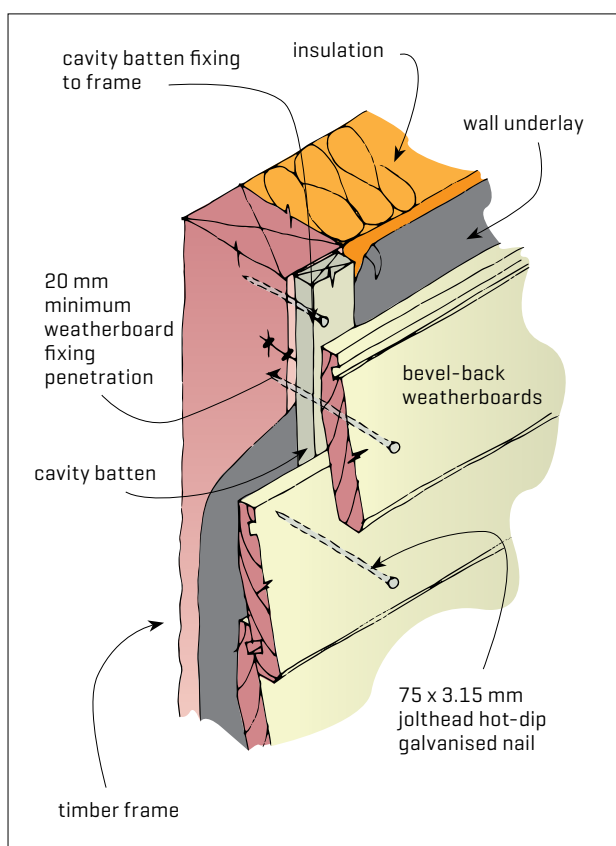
Cladding fixings using structurally fixed battens and flexible wall underlay. Drawing shows 75 x 3.15 mm nails for bevel-back weatherboards – 60 x 2.8 mm can be used for rebated bevel-back and rusticated weatherboards. Longer fixings will be required where rigid wall underlays are used – see 6.0.9.
